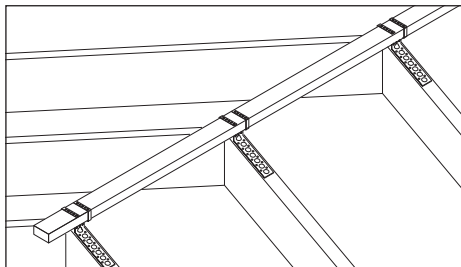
Secure ridge batten brackets and fix ridge batten
